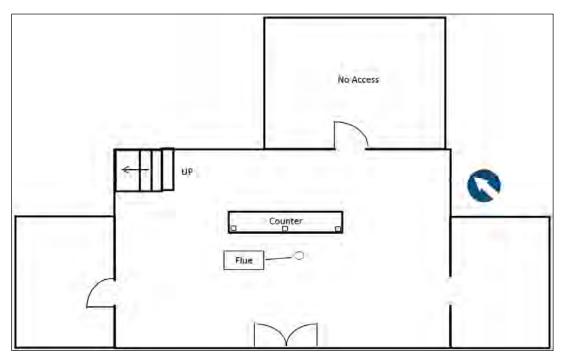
FIRST STORY PLAN (NOT TO SCALE)
